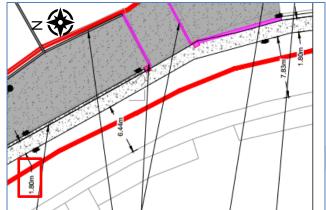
Extract of Proposed Footway widths from preliminary design drawings
